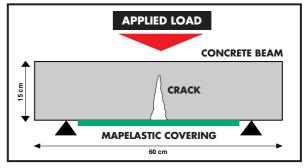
Protection of a hairline crack with Mapelastic on the underside of a concrete beam subject to flexural stress
